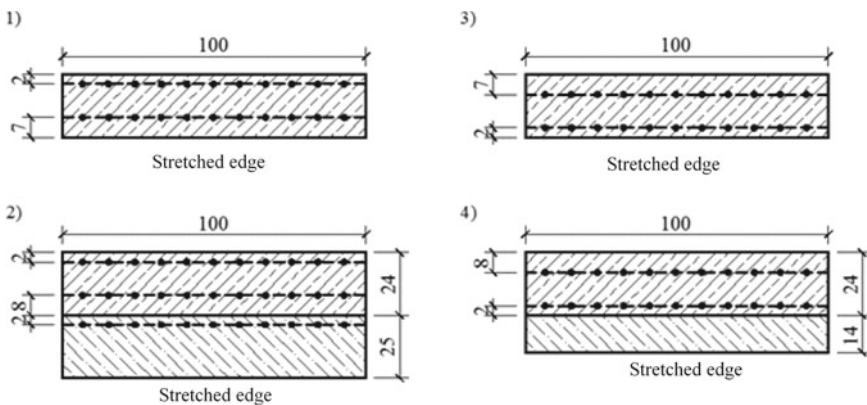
Reinforcement schemes for single-layer (1, 3) and two-layer specimens with a vermiculite-concrete layer (2, 4)
